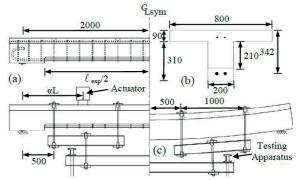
(a) Elevation of Test Specimen (b) Cross-section, (c) Testing Apparatus: Unloaded (Left) and Loaded (Right)
